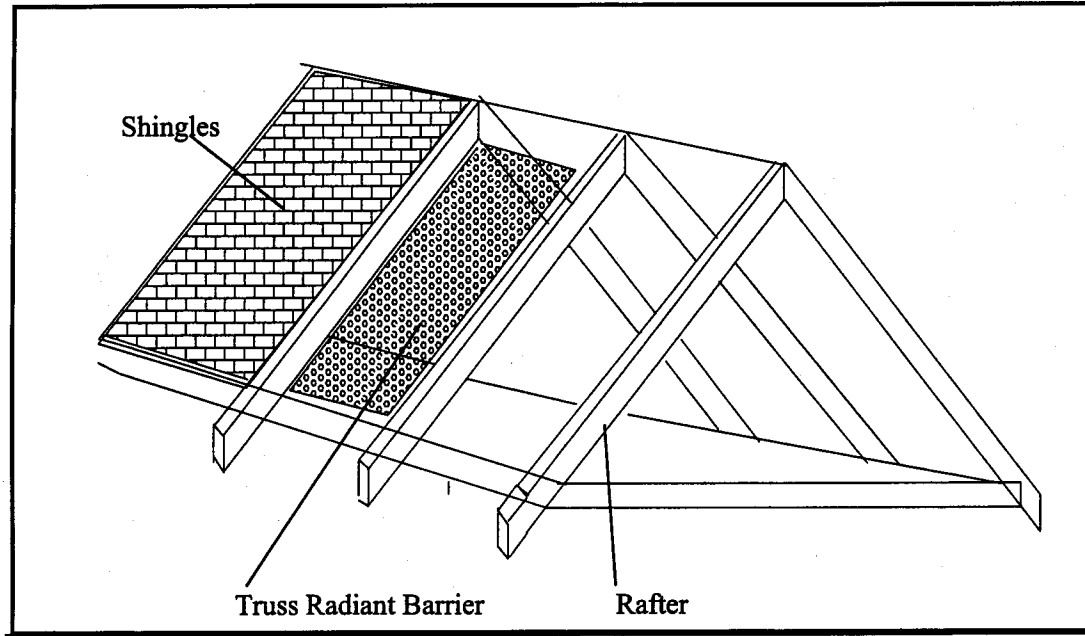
Attic Geometry Showing the Selected Radiant Barrier Configuration
